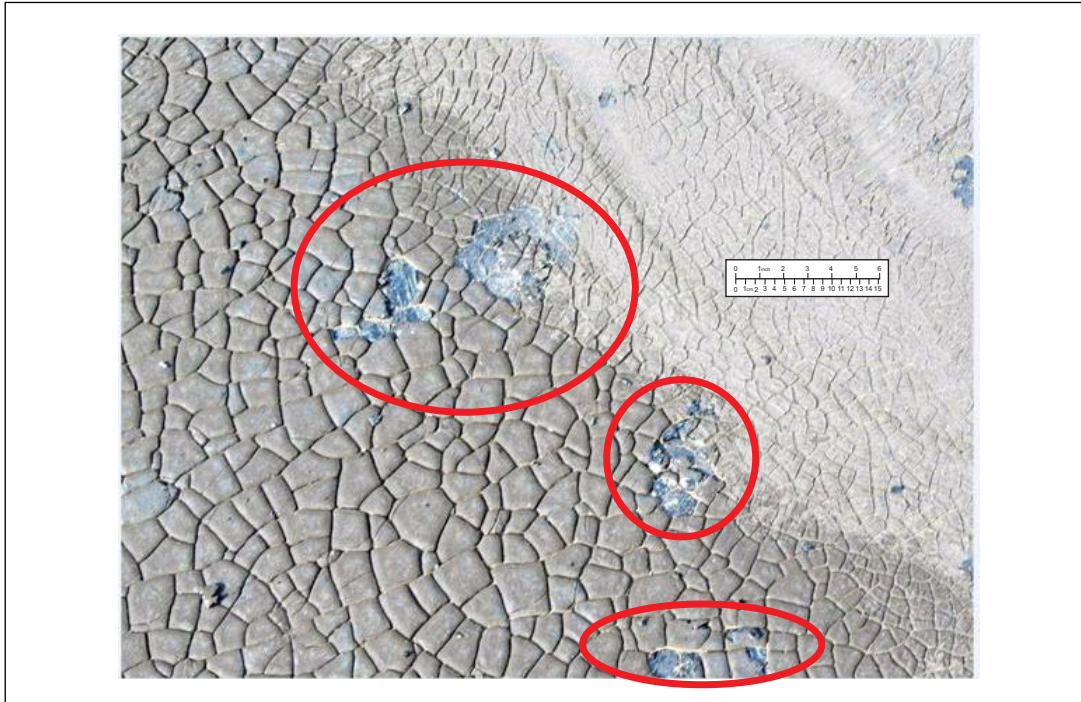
Hail damage to severely "alligatored" roof (built-up roof)
